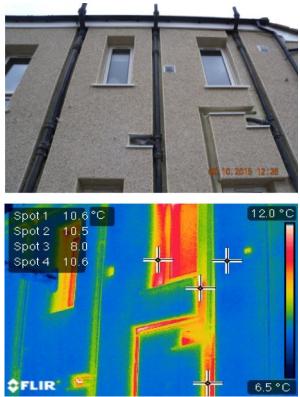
Thermographic images were used to highlight the gaps in external wall insulation due to poor detailing, leading to thermal bridges.
